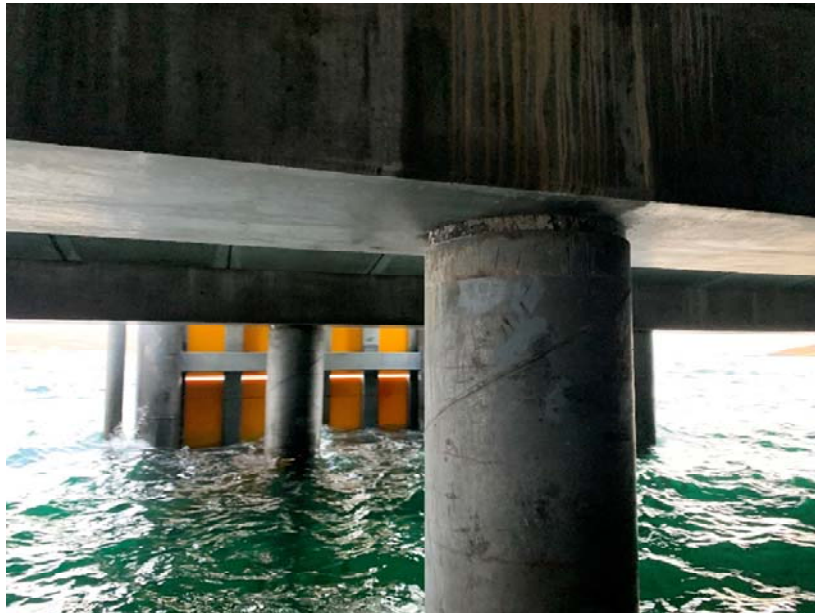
Typical notable spalling at plastic hinge, Pile C4
